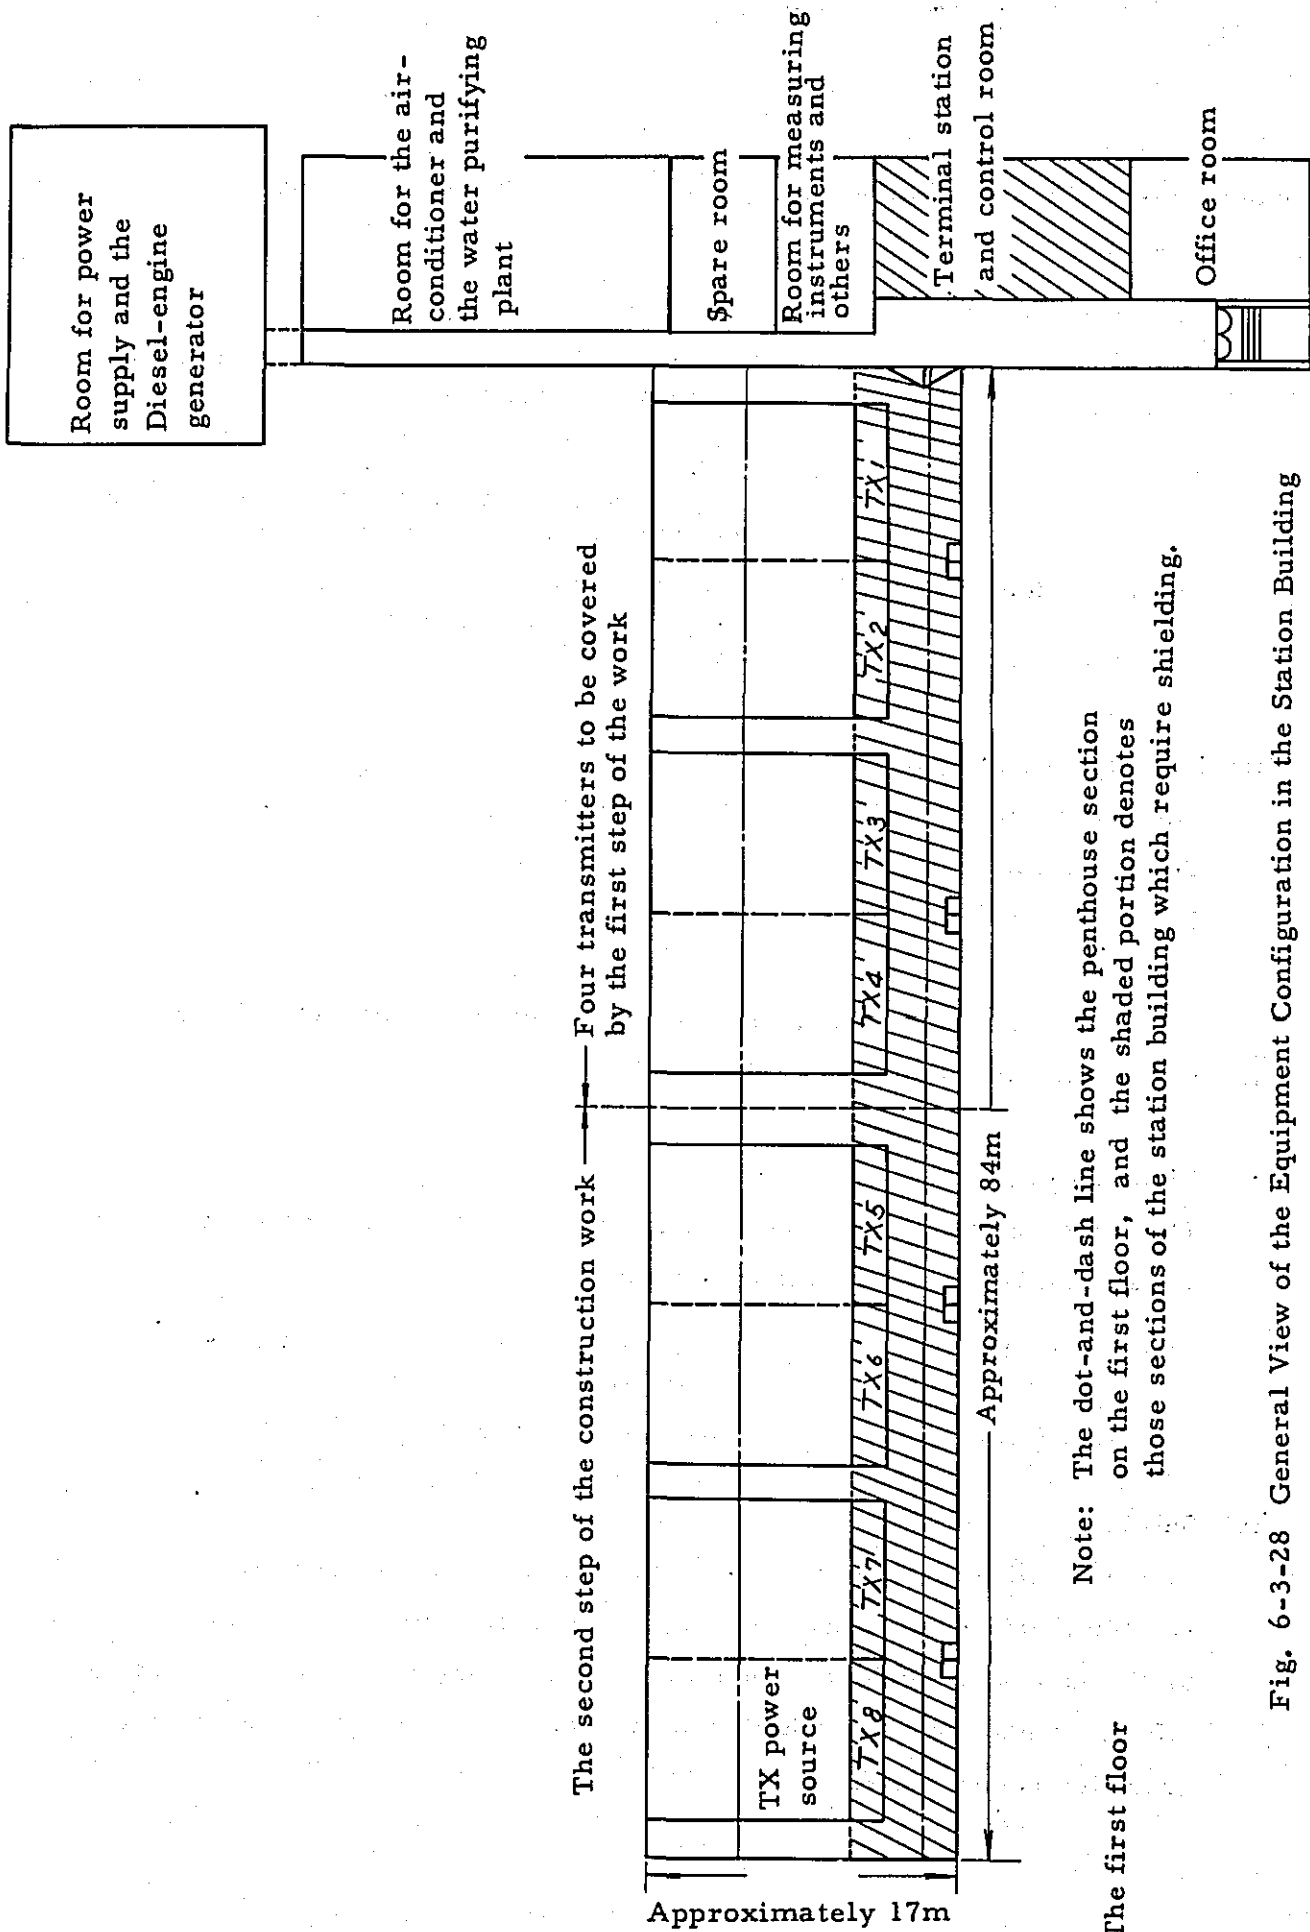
General View of the Equipment Configuration in the Station Building
